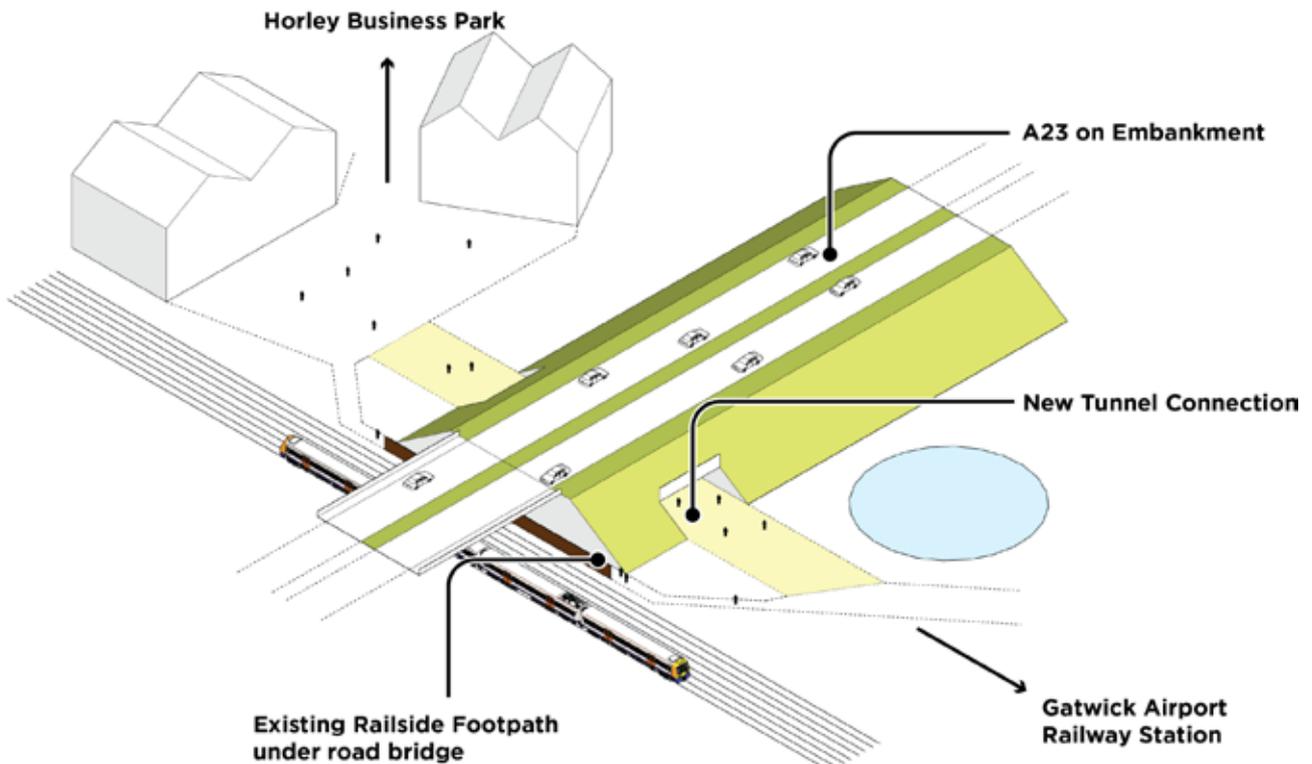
Potential approach to establishing a new pedestrian connection to Gatwick Airport railway station under A23 embankment
